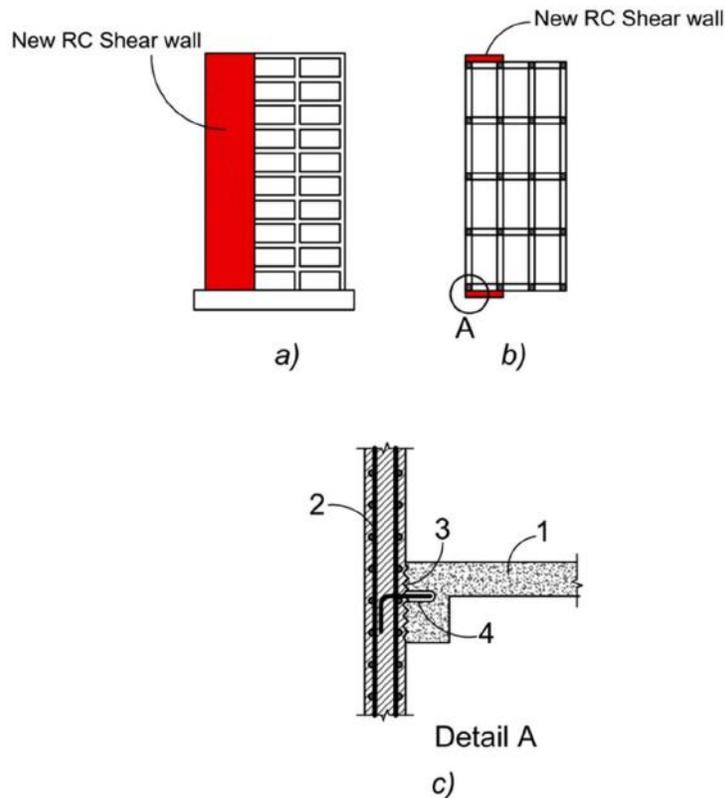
Addition of new RC shear walls at the perimeter: a) elevation view; b) plan view, and c) wall-to-floor connection (1- existing RC slab; 2- new RC shear wall; 3- roughened interface between the new and existing concrete; 4- steel anchors).
